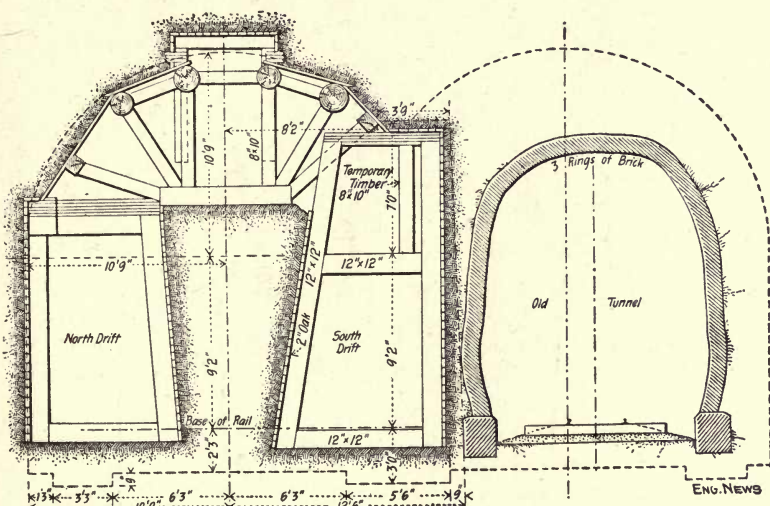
Section of New Tunnel Excavation, Showing Drifts and Bracing.
